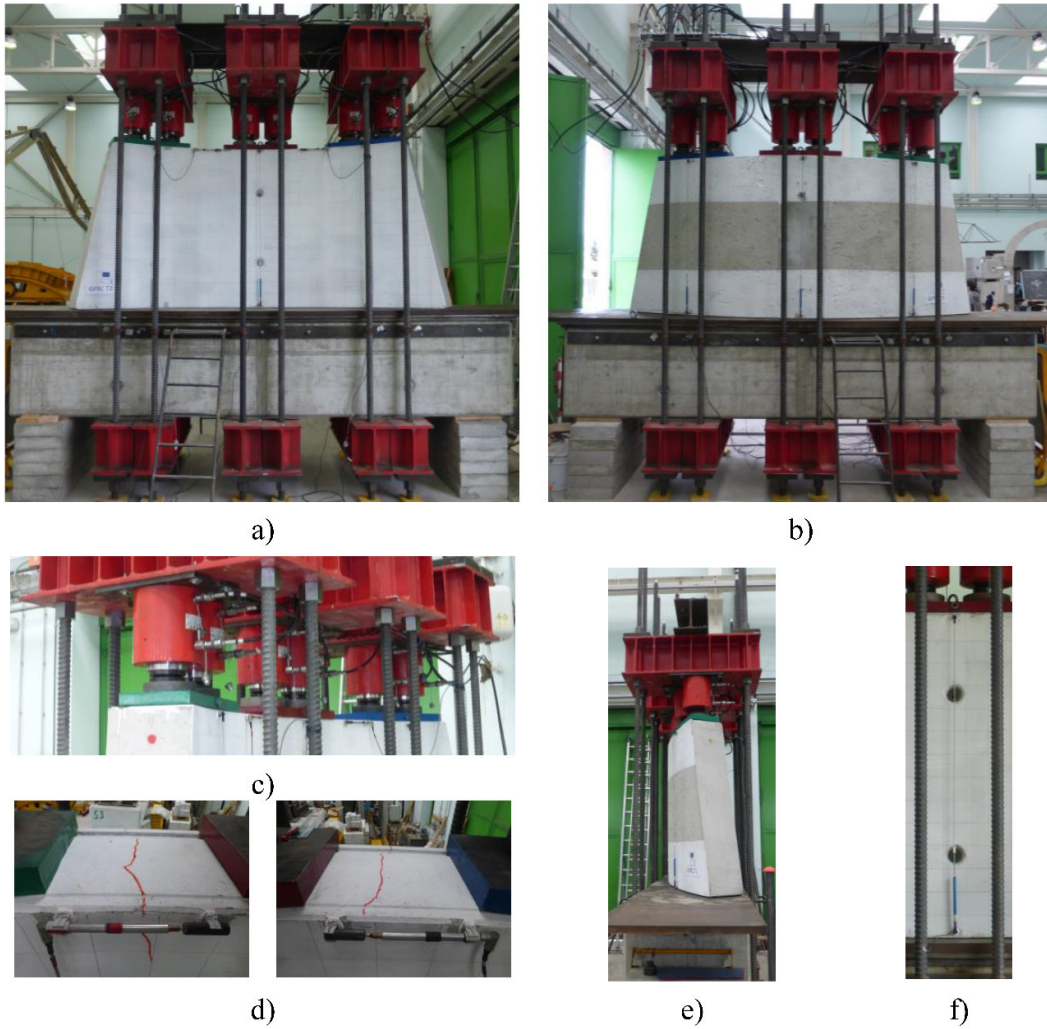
Point load test set up: a) intrados view; b) extrados view; c) loading steel pad view; d) LVDTs between the steel pads (intrados surface); e) lateral view; and f) potentiometer detail.
